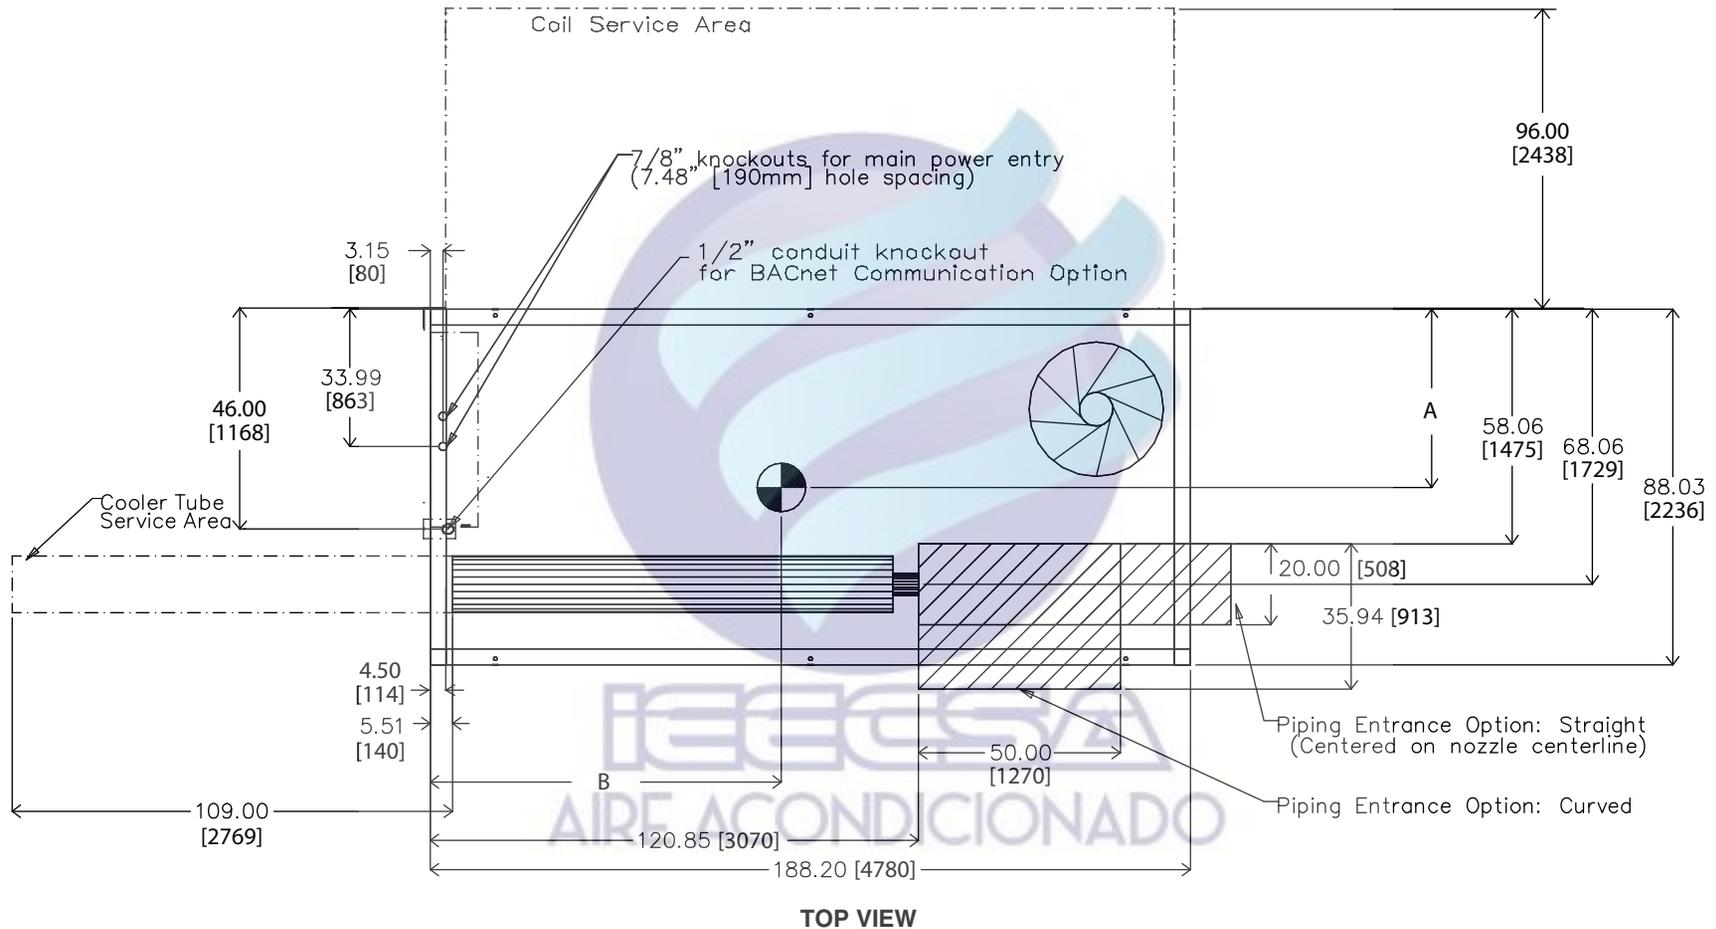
30XA090, 100, 110, 120 Air-Cooled Liquid Chiller Dimensions without Pump (See Note 4)
